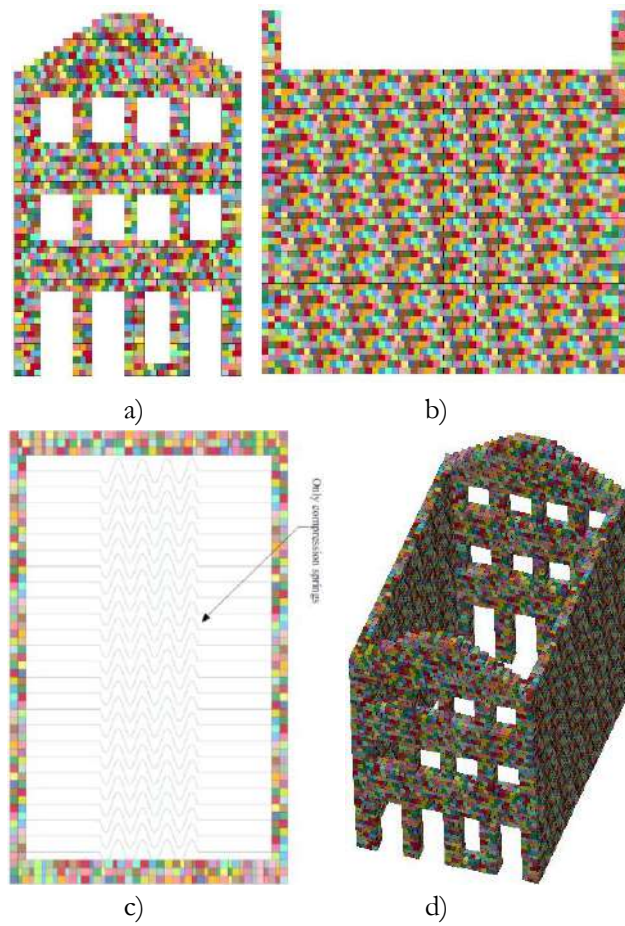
Numerical model of a 4-axis building type: a) front view, b) side view, c) plan view, and d) isometric view
